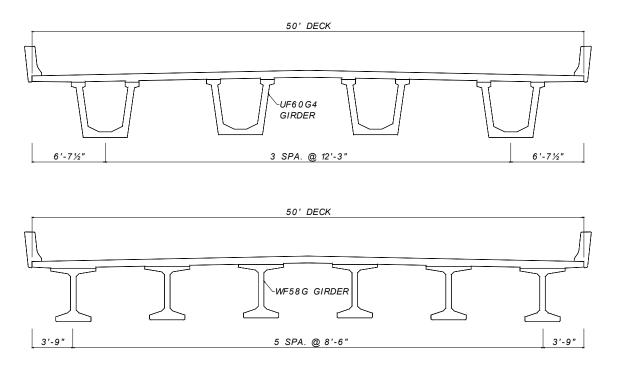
Bridge Sections for Tub and I-Girder Spans of 140 ft.
